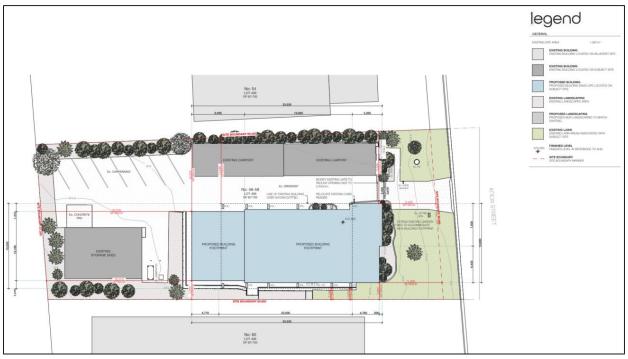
Proposed Site Plan (Source: Lead Architects 2024)
